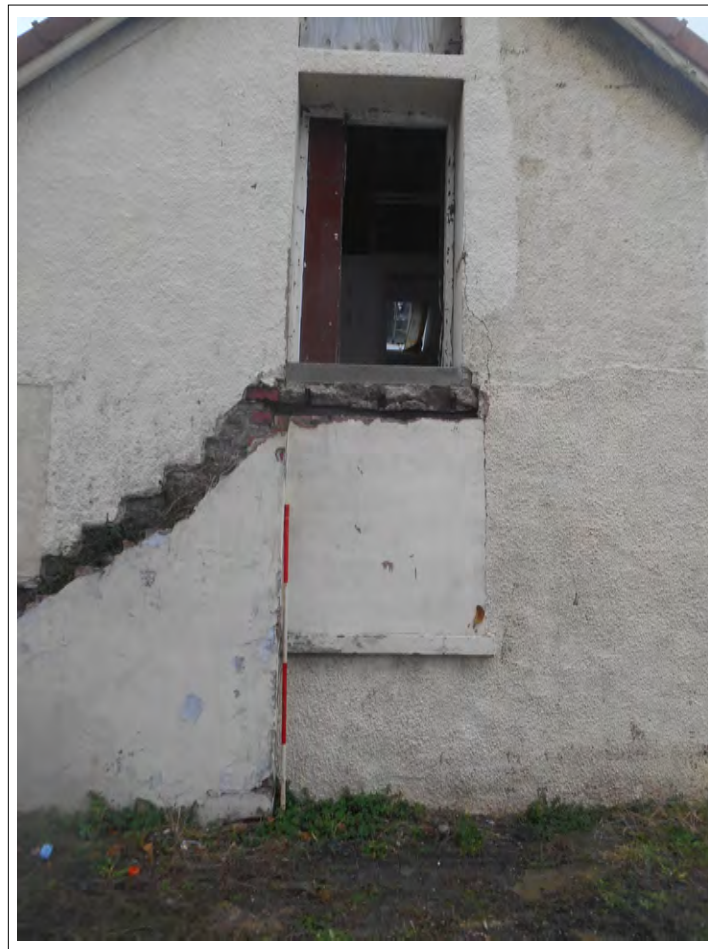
Detail of first floor door and exterior stair case, east facing wall. Scale 2m
